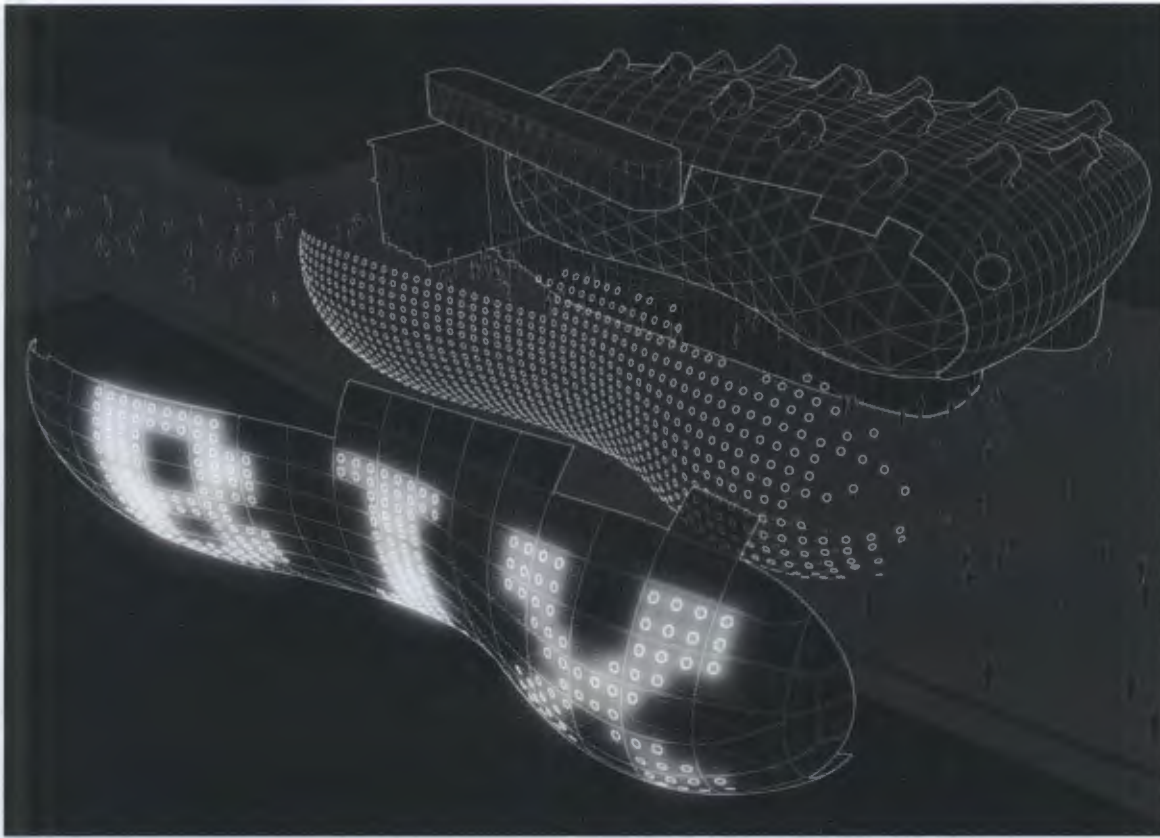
A design drawing showing an exploded view of the skin and media components of the main facade.
